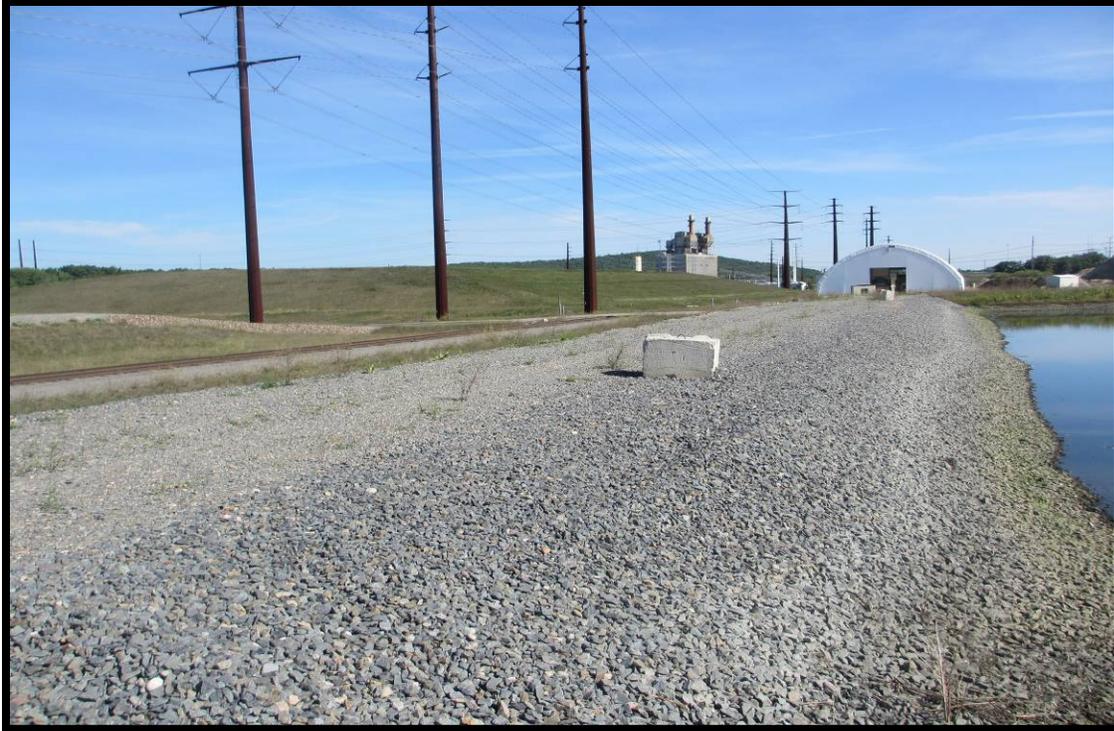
Crest on West berm of Northeastern Secondary Pond
